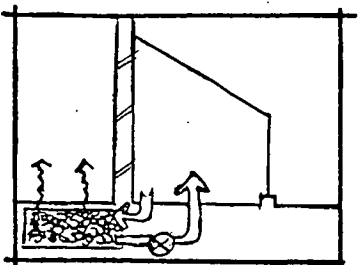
Heat Transfer Methods between an Attached Sunspace and Building;
